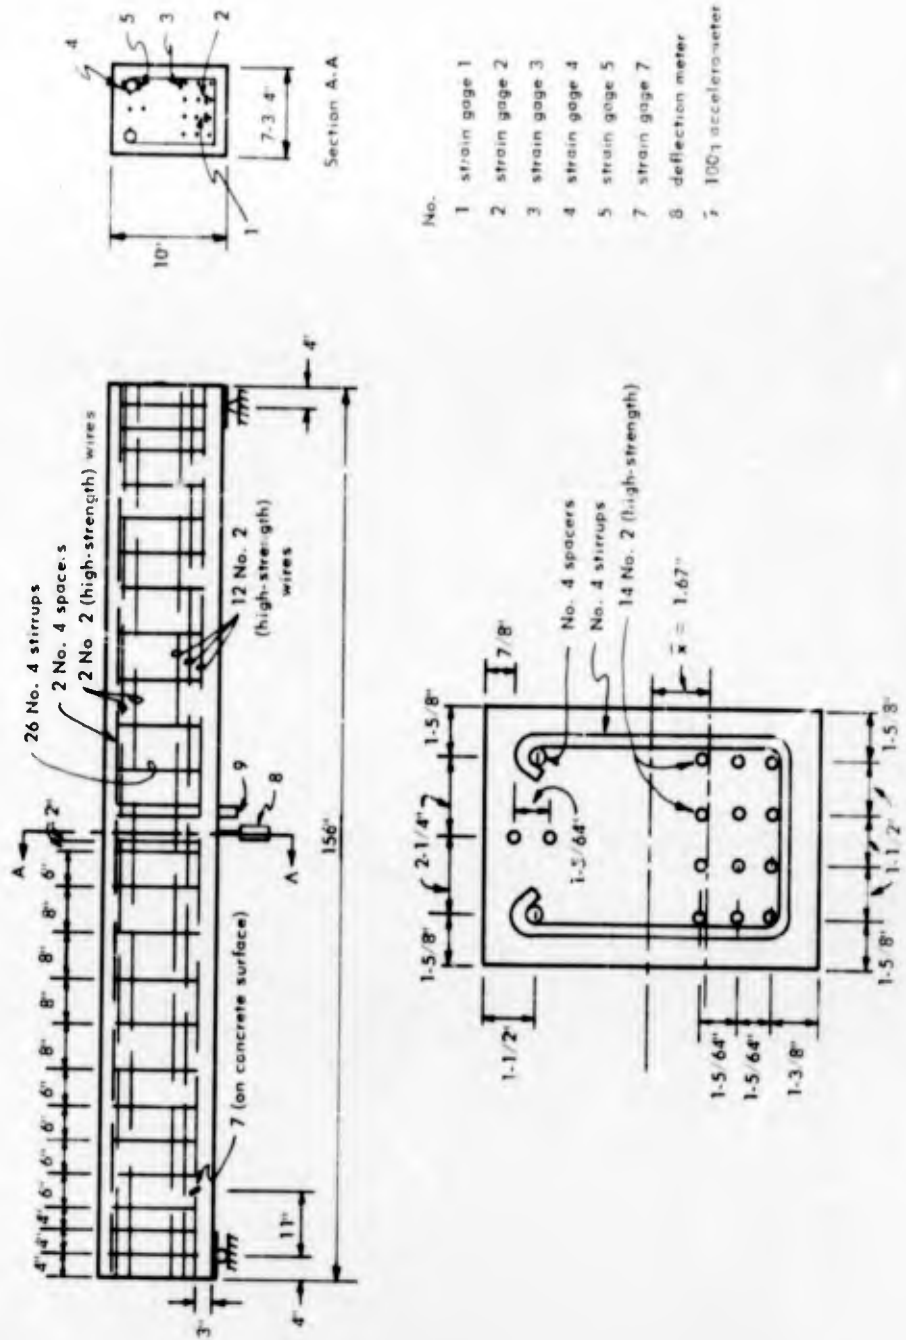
Pretensioned concrete beam dimensions including instrumentation locations.
